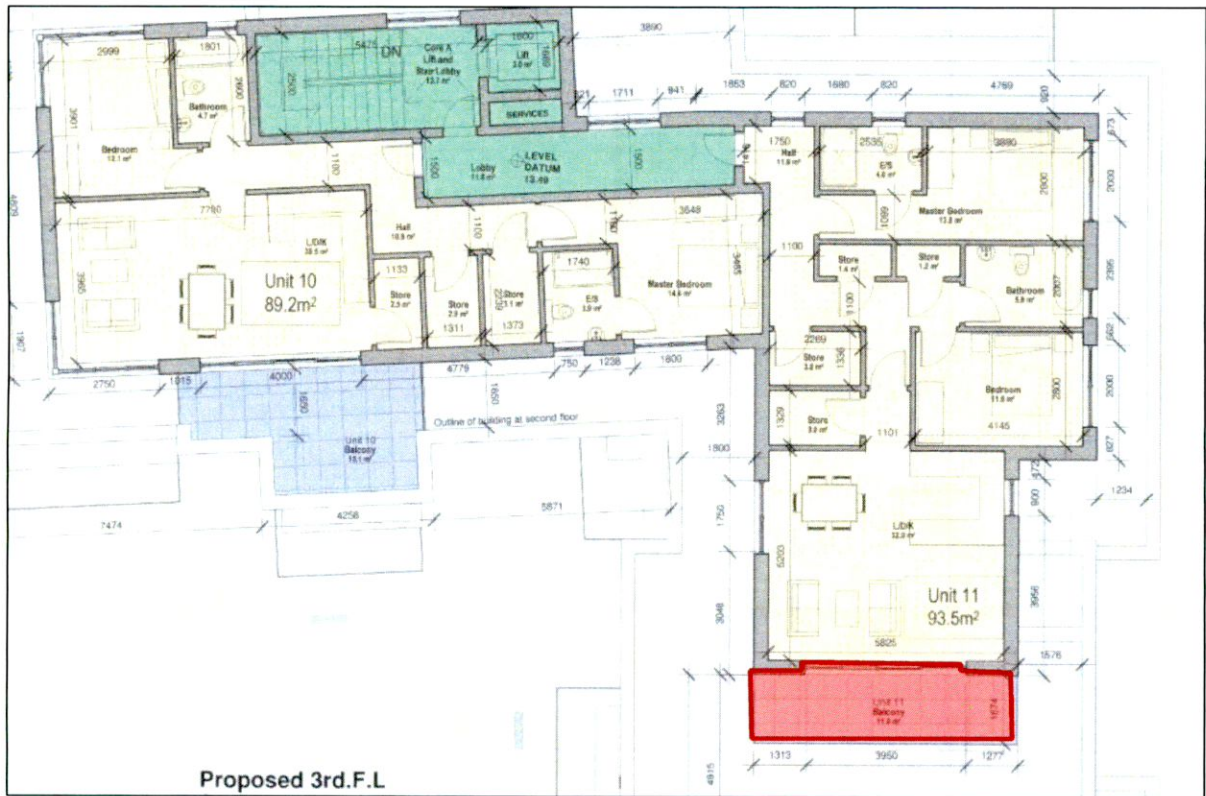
Proposed third floor plan showing the south facing balcony (red outline).
